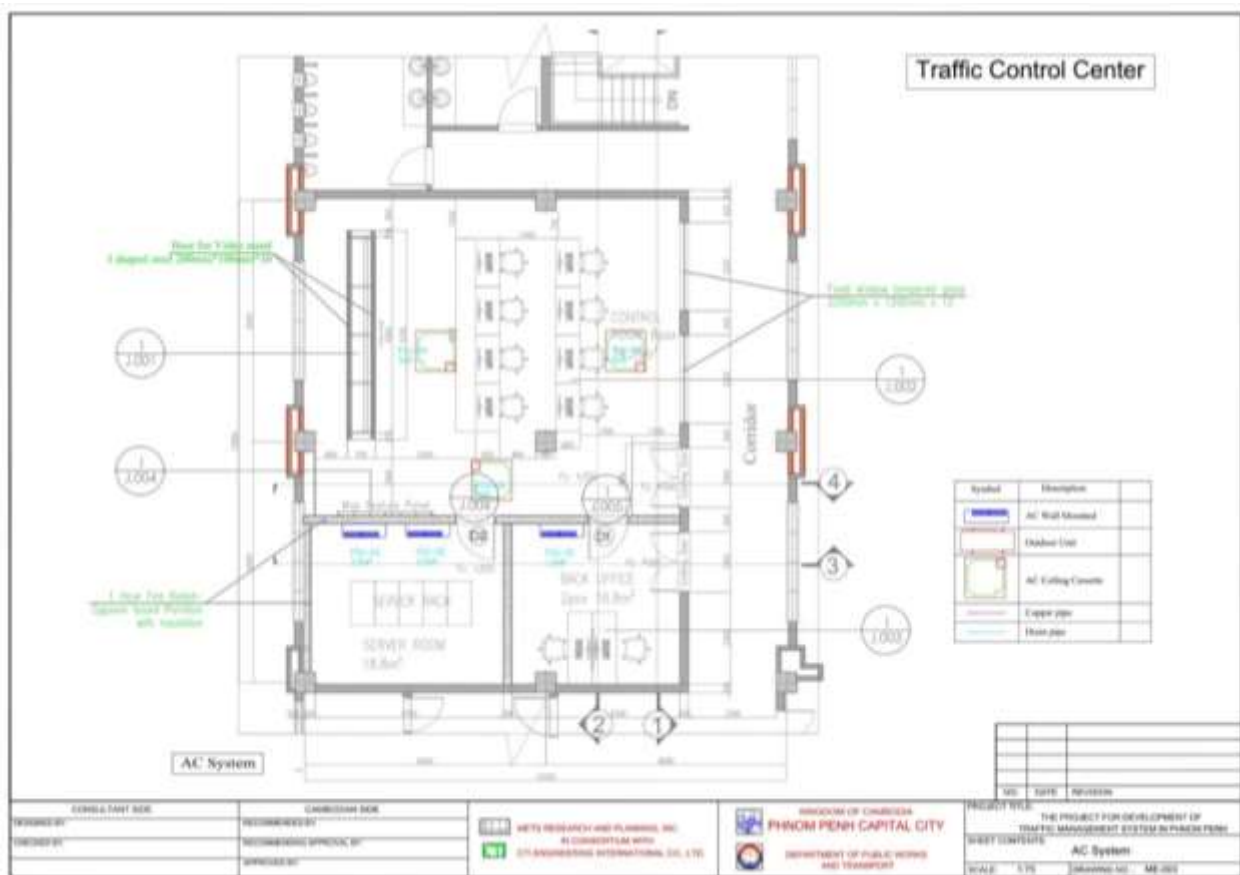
is an image of floor plan of existing Traffic Control Center (TCC) at the 9th floor of City Hall New Building showing the area for control room, server room, and the back office – a total floor
